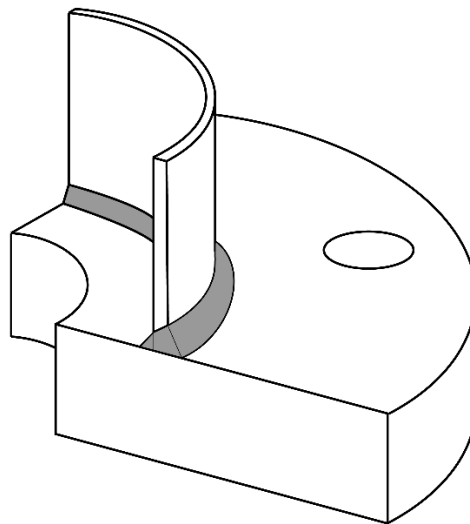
Illustration. Full penetration welded post to base plate connection.
